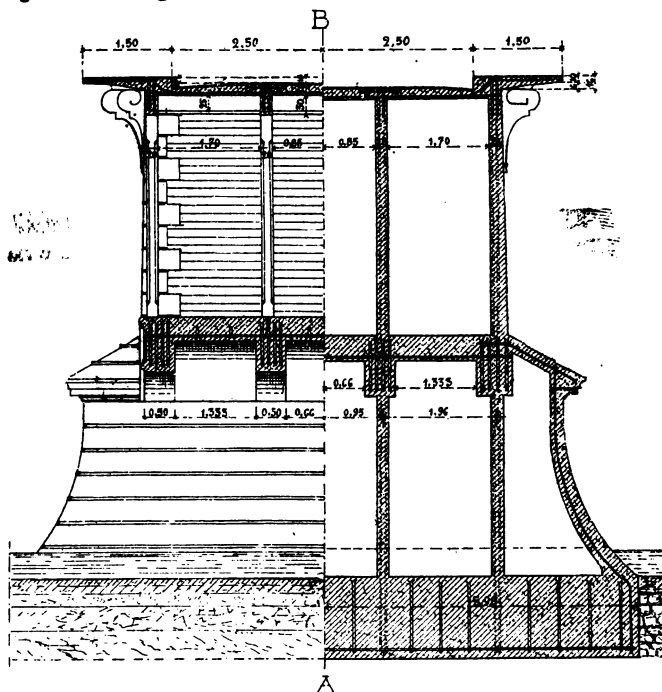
Section through Pier of Chatelleraut Bridge.
